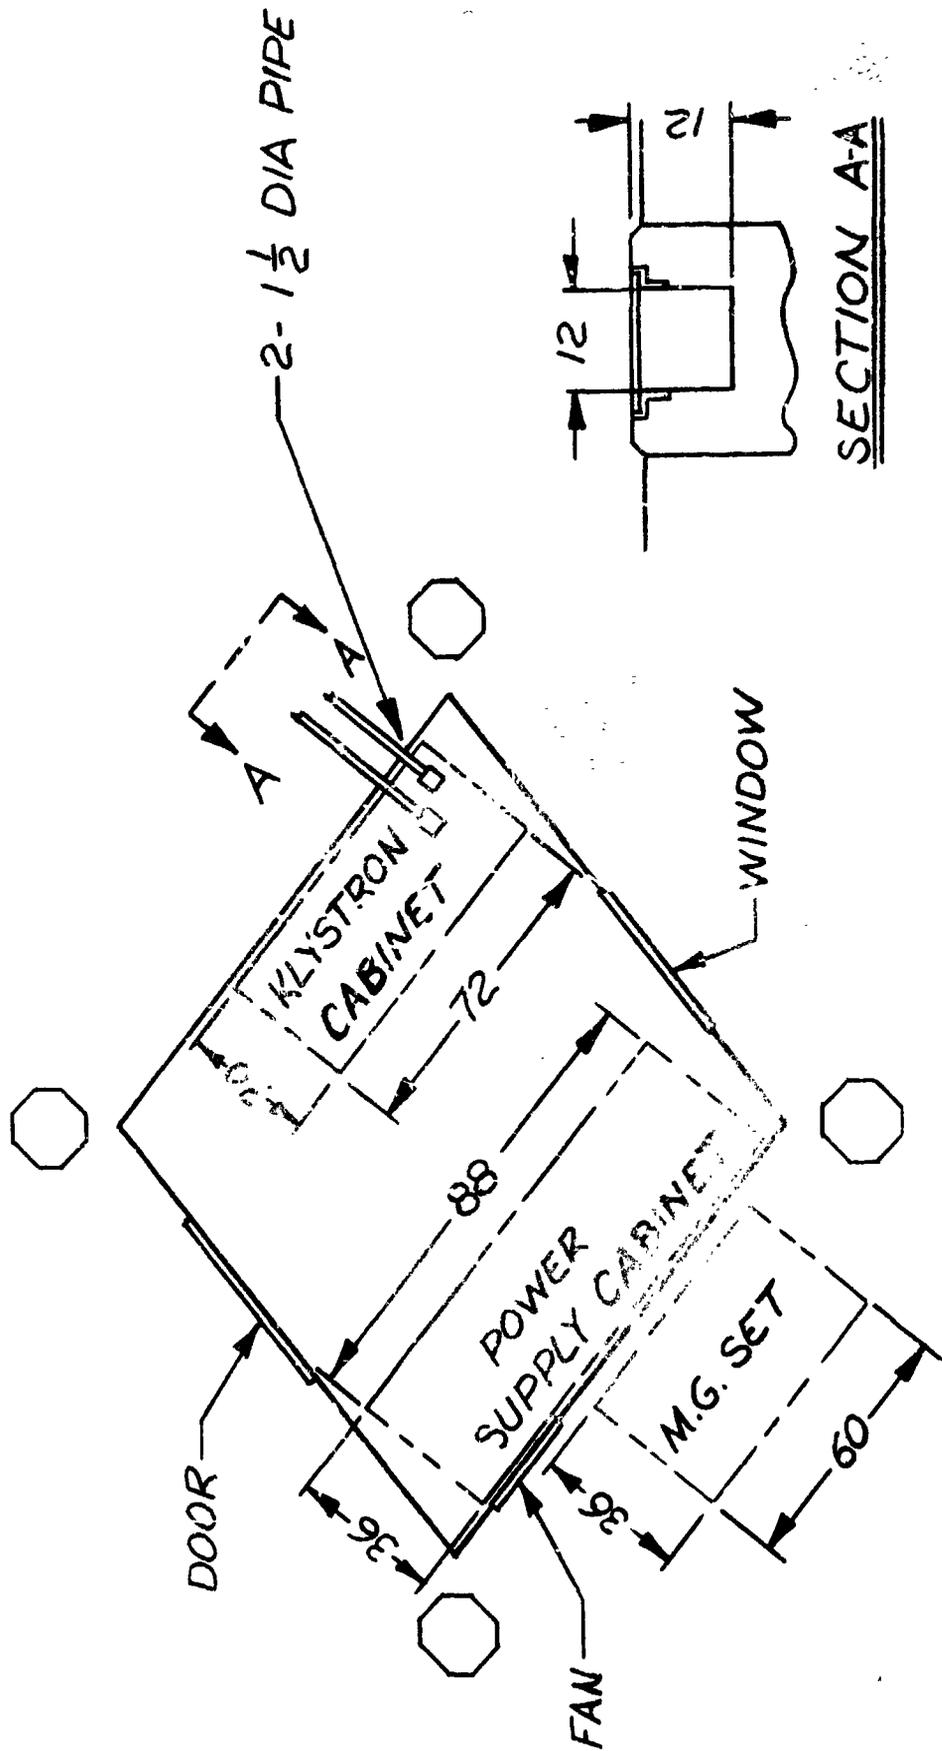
Plan of Equipment House for 30-Foot Antenna
